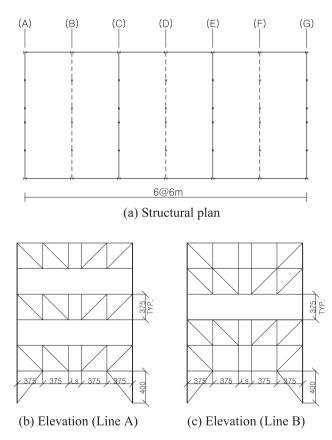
Six-story staggered truss model structure with a central corridor (Type A) (mm).
